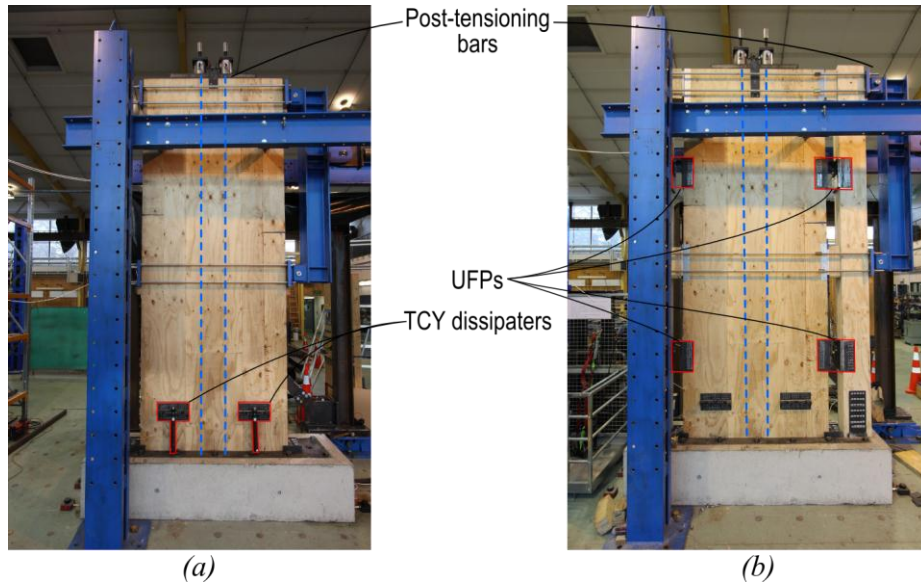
Pres-Lam walls. (a) Single wall; (b) Column-wall-column coupled system .
